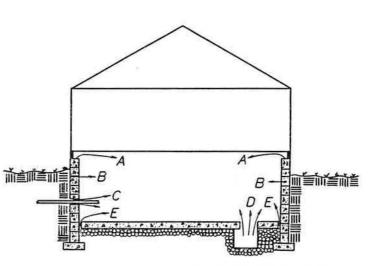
</sup>, Illustration of openings and cracks that need to be sealed to prevent radon entry and ensure the effectiveness of sub-slab ventilation. Radon entry points include unsealed concrete block tops (A), unsealed concrete block walls (B), around pipe penetrations (C), unpaved floor openings (D), and floor-wall drains or cracks (E).
